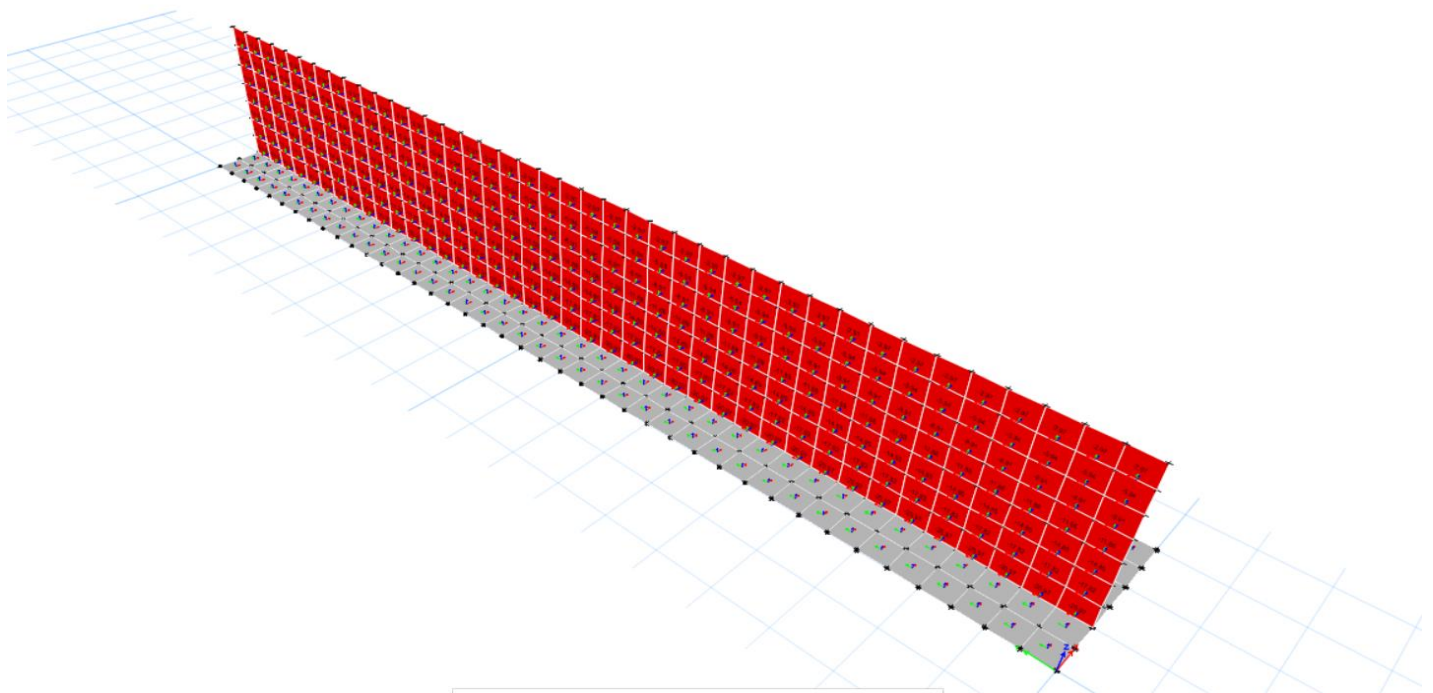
Modeling of 3.5m ht. of retaining wall in ETABS
